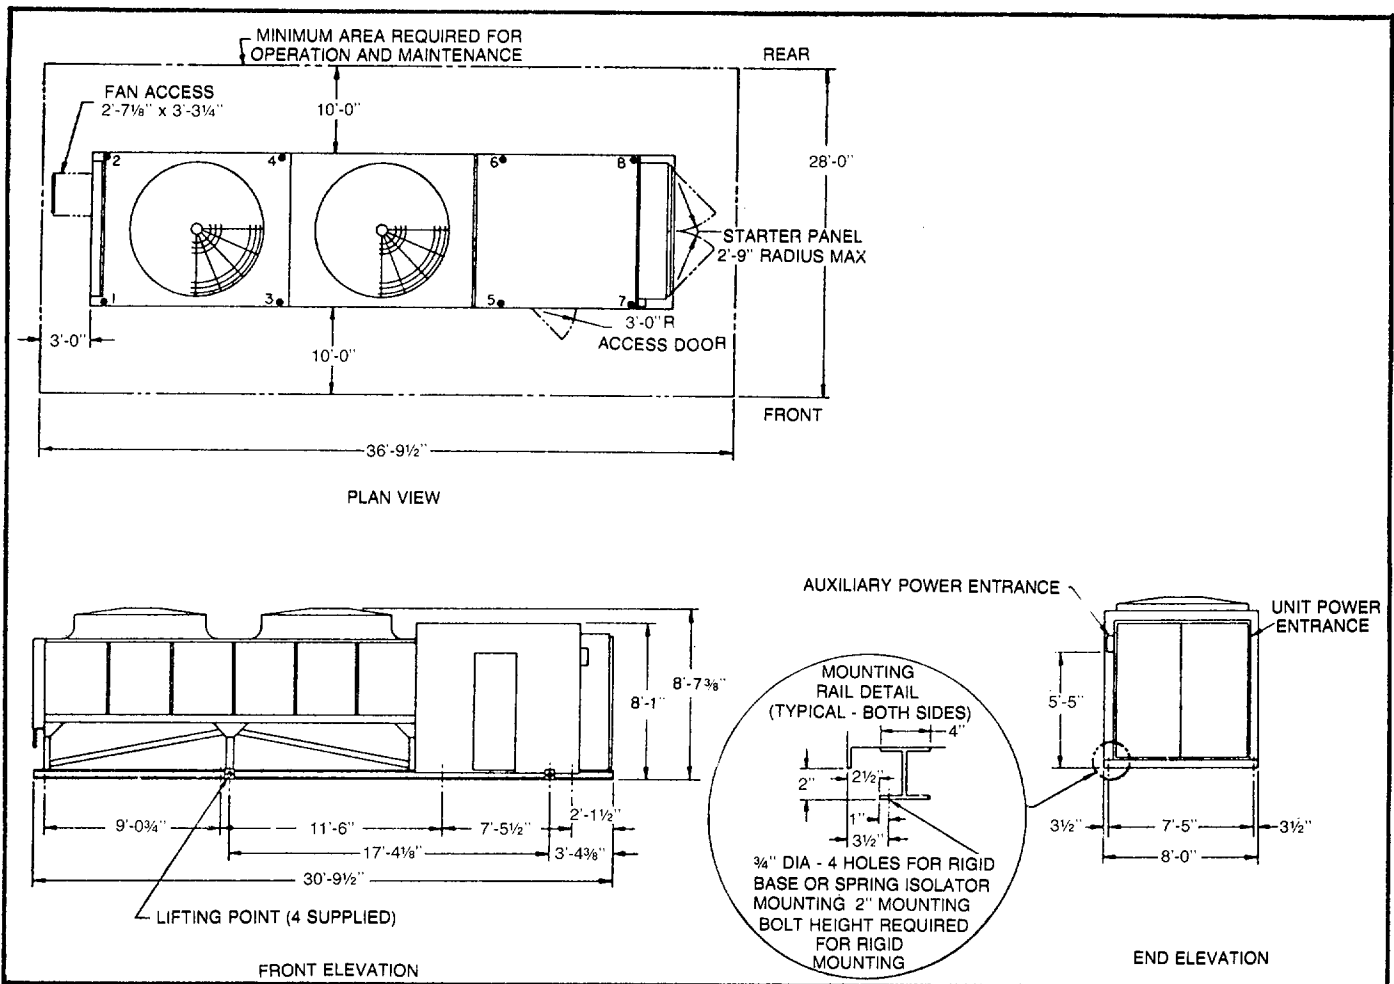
Unit Dimensions For: CVAC-013 with A1 Evaporator and B Condenser CVAC016 with A1 Evaporator and B Condenser
